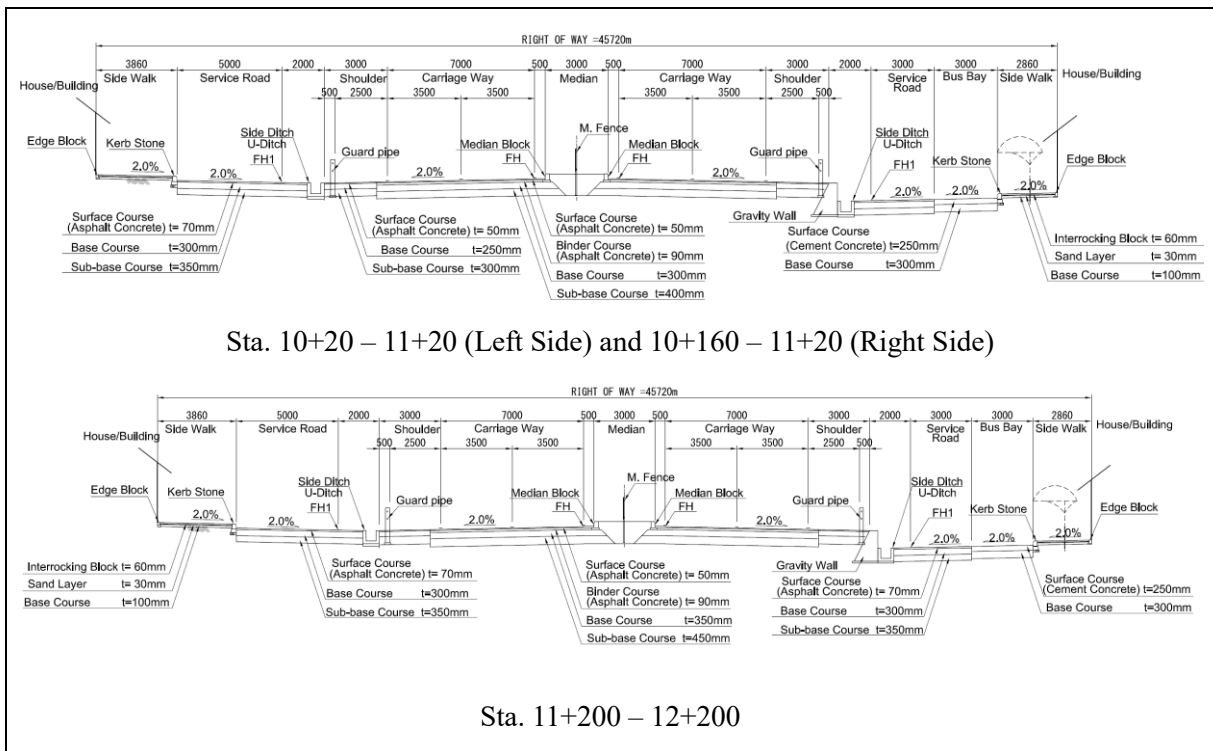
Typical Cross Section (Section 6 Banepa Bazar)
